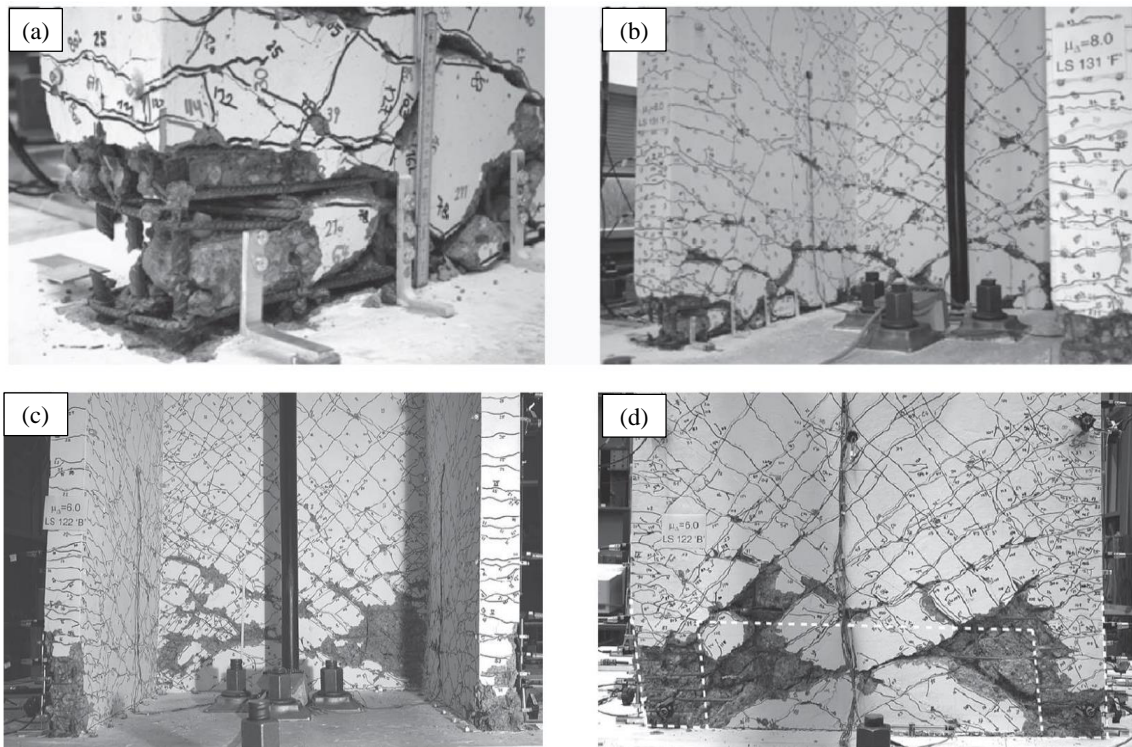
(a & b) specimen TUA at failure point (c & d) specimen TUB at failure point (Beyer et al. 2008)
